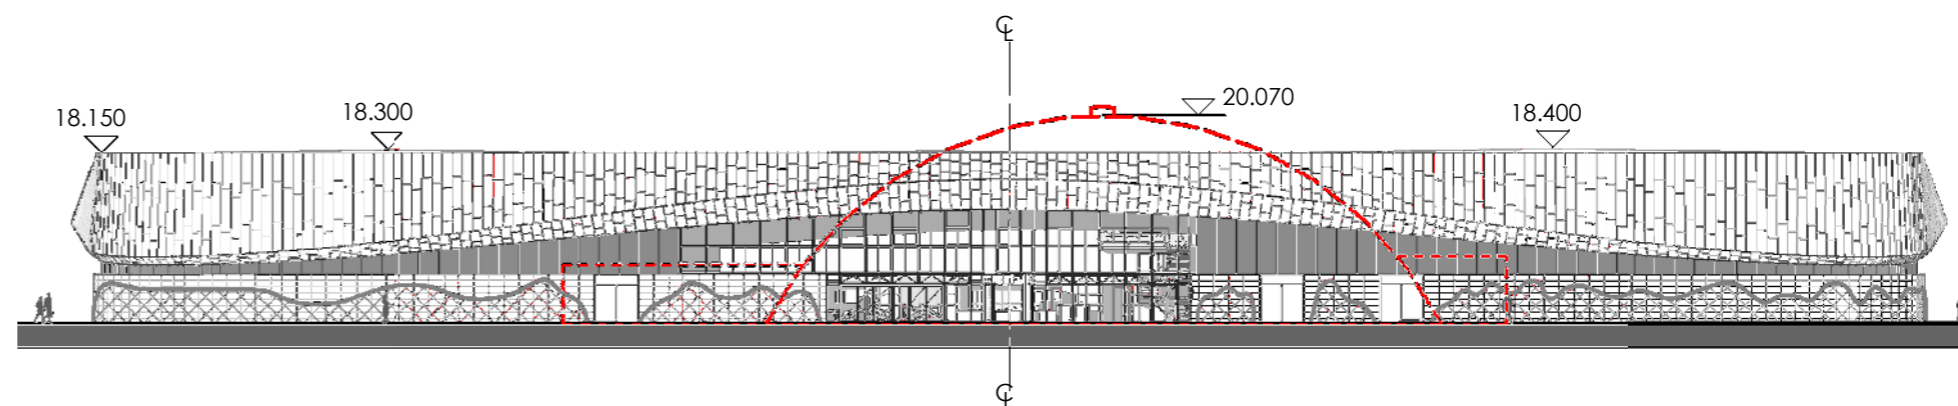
Comparative scale of existing LVIC building (in red) with proposals - south west elevation to car park
